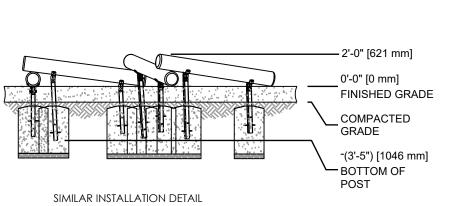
DETAIL: HILLSIDE TUNNEL / Scale: 1/2" - 1' - 0"
